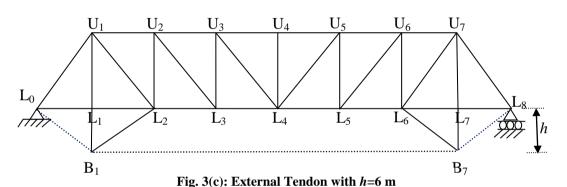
Determinate Pratt Truss Posttensioned with Different External Tendon Layouts
